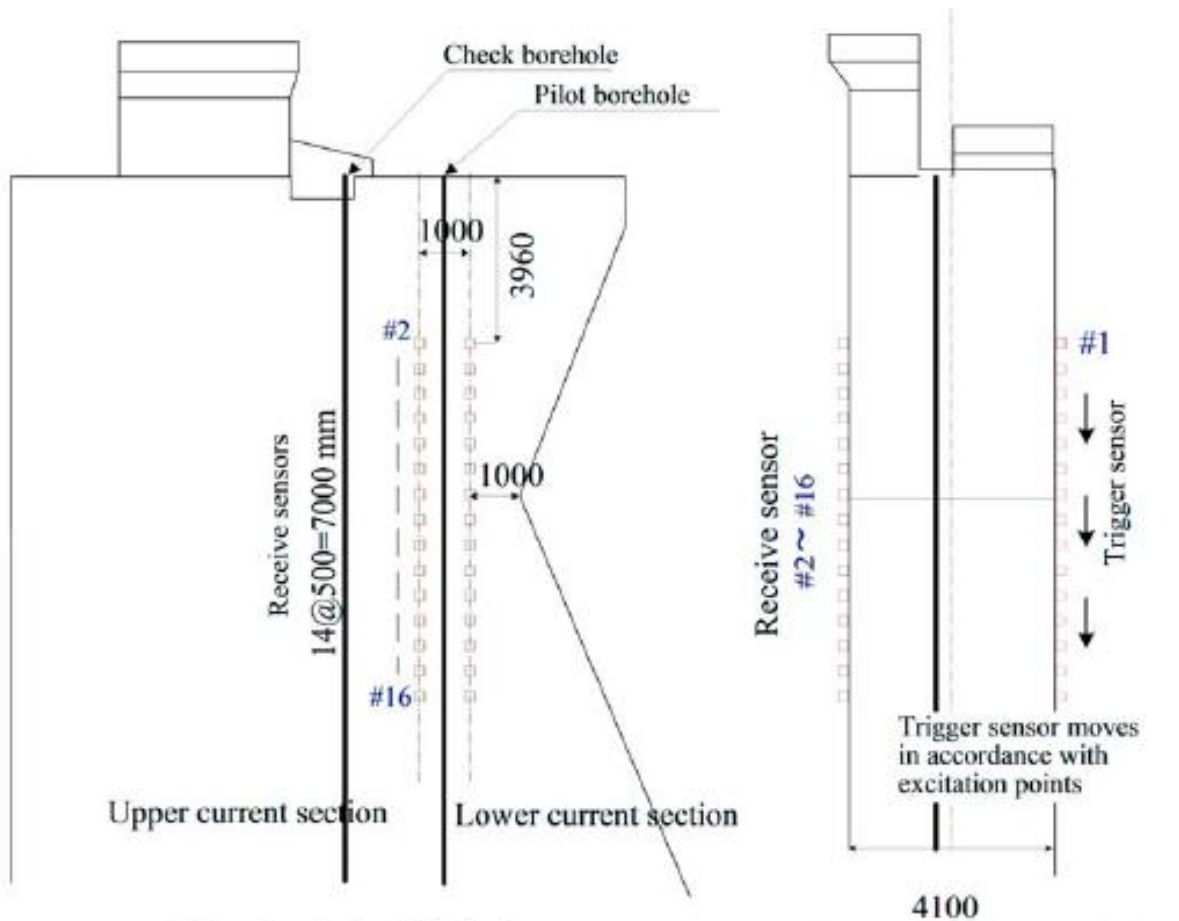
(a) Grouting maps for Pier 1; (b) Pier 2.
